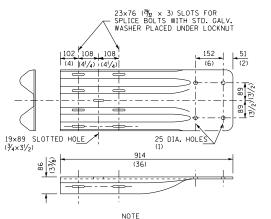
PLATE A SHALL BE PLACED BETWEEN RAIL ELEMENT AND BLOCK-OUT AT NON-SPLICE MOUNTING POINTS ONLY WHEN STEEL BLOCK-OUTS ARE USED.
